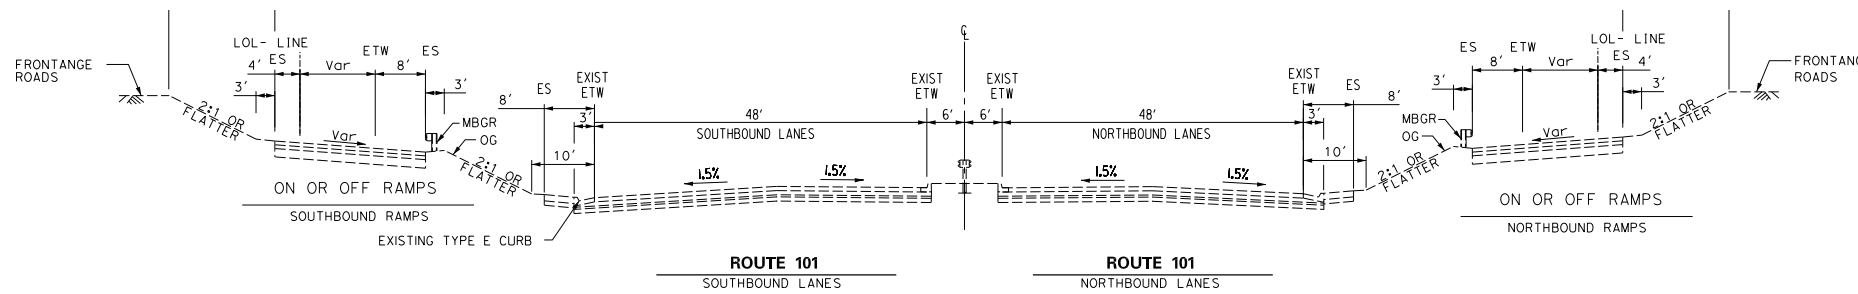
Existing Freeway Typical Section with On-ramp and Off-ramp
